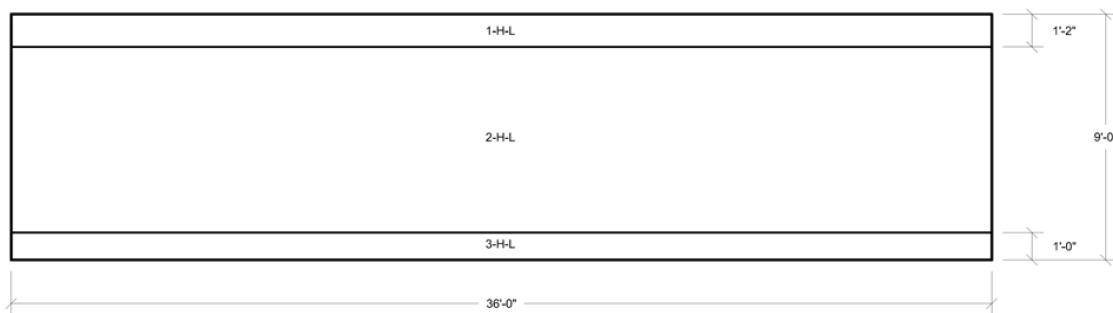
H.7-11 Tunnel Walls Looking From Outside Horizontal Reinforcement Zones Near Side Face
